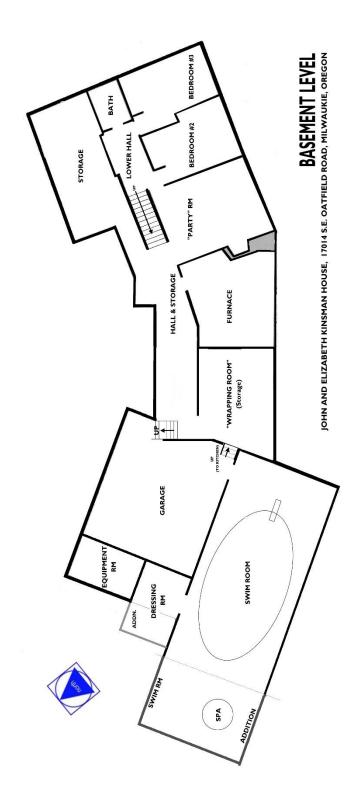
Kinsman House, SITE FLOOR Plan (Approximate Dimensions- No-Scale), 2020
